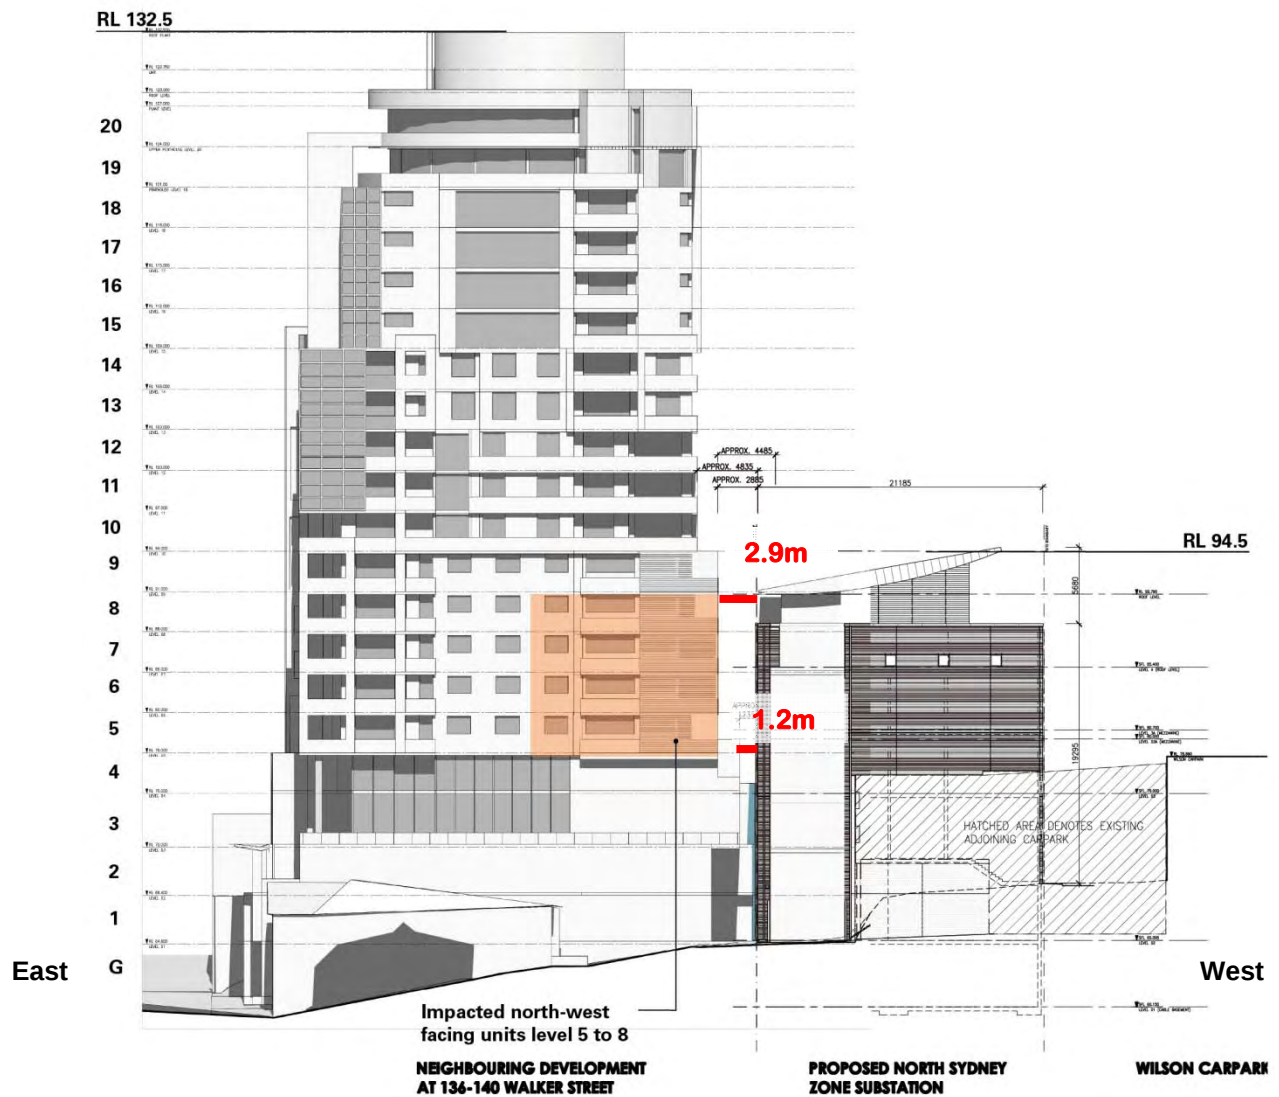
Northern façade of 136-140 Walker Street and proposed substation
